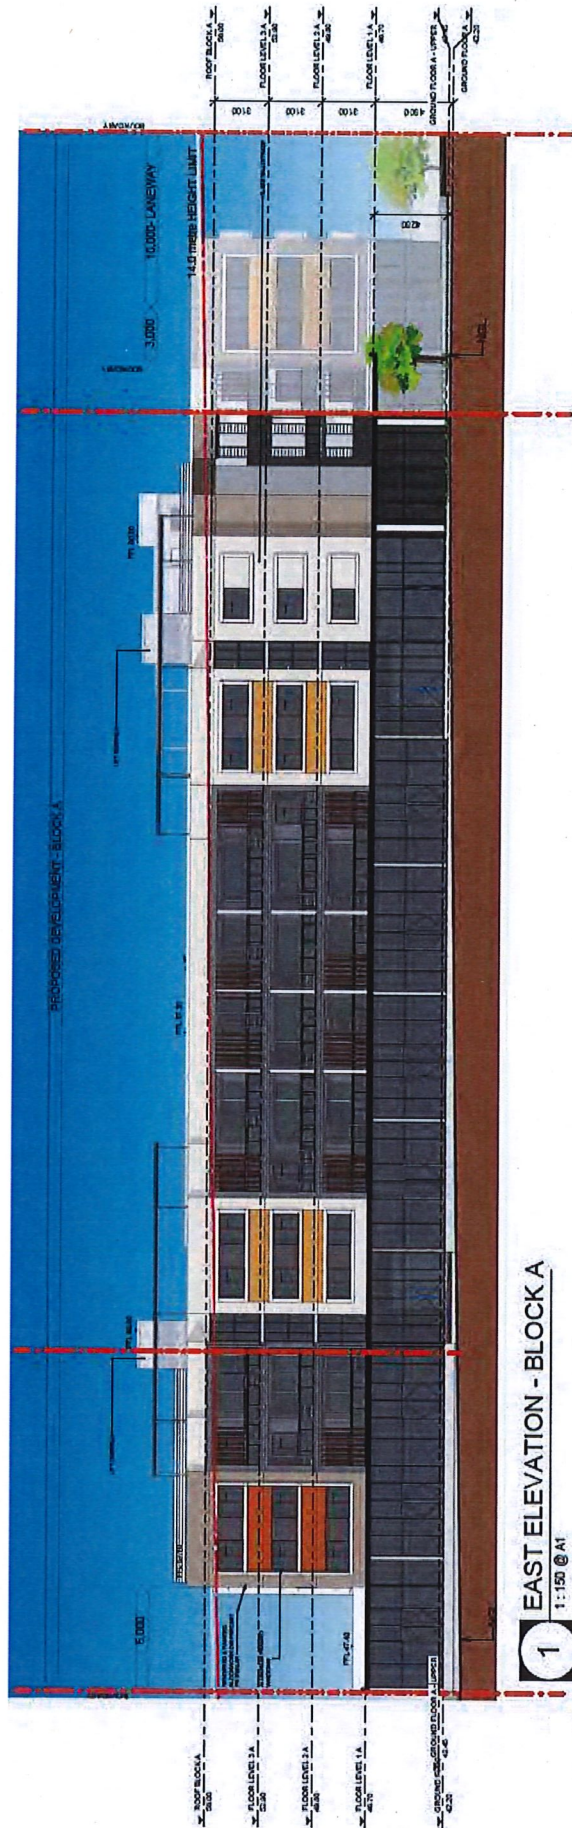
East elevation – Block A – showing area exceeding maximum building height control
